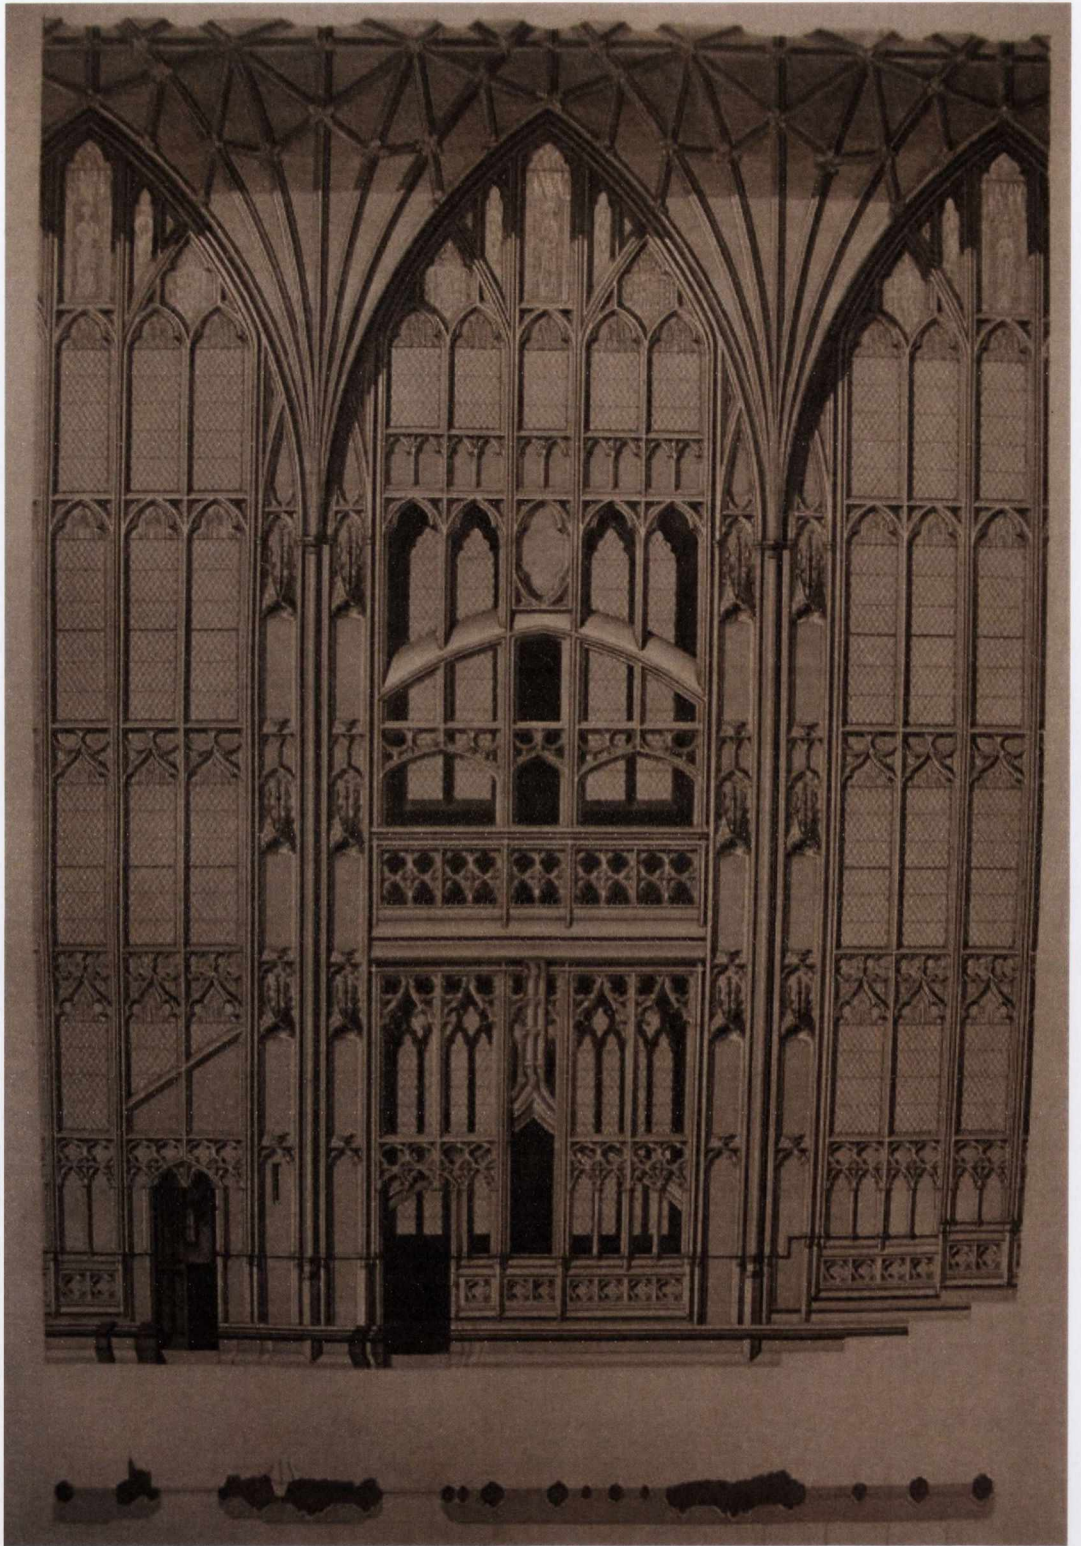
Gloucester Cathedral, interior elevation, from Carter, *Plans, elevations, sections and specimens of the architecture of the cathedral church of Gloucester* (1809), pl. 11.
